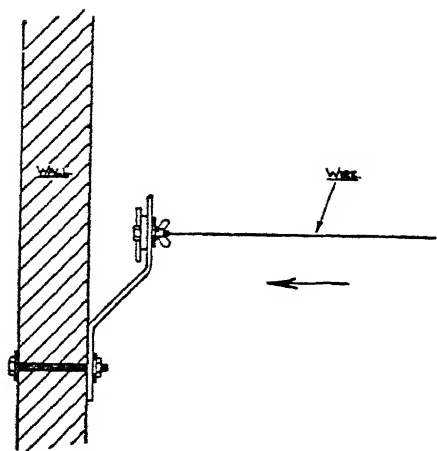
SIDE ELEVATION AND FIXING OF WALL-ATTACHMENT, SHOWING LATERAL ADJUSTMENT
